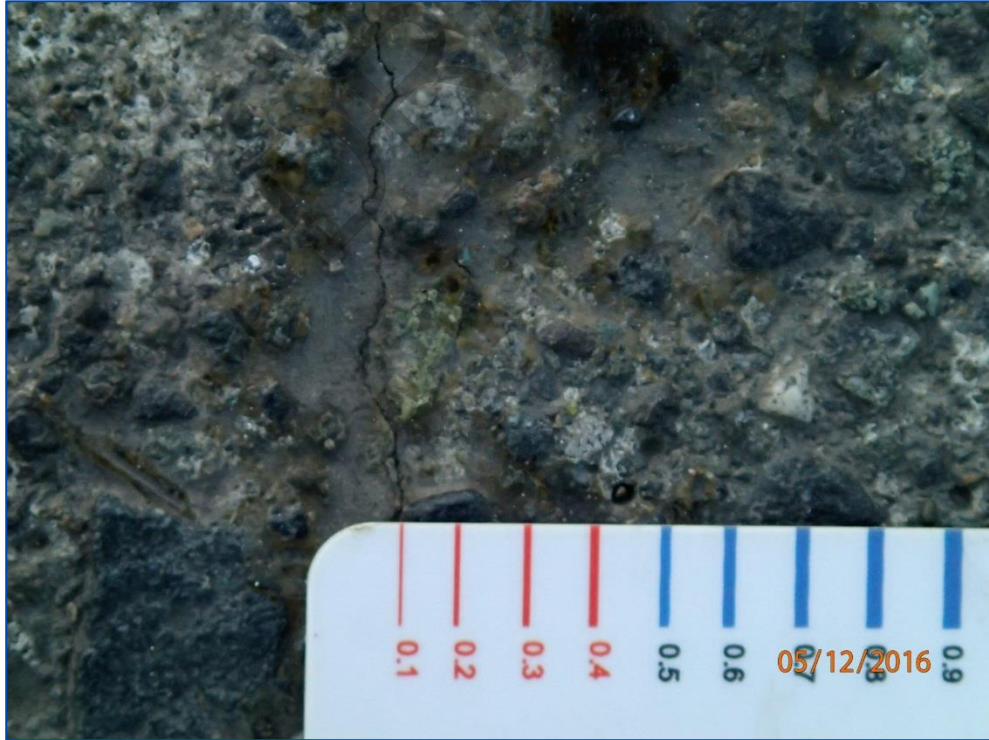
Close-up of Photo 9 showing 0.1 mm wide crack with failed epoxy.
